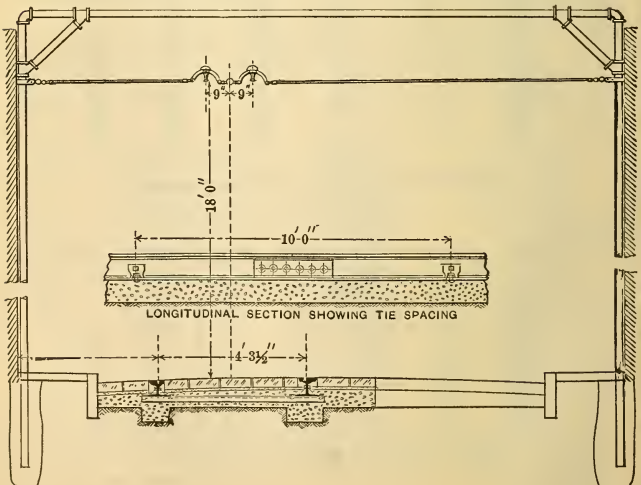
Section of Track and Overhead Construction in Narrow Streets, showing Overhead Pipe Brace.
